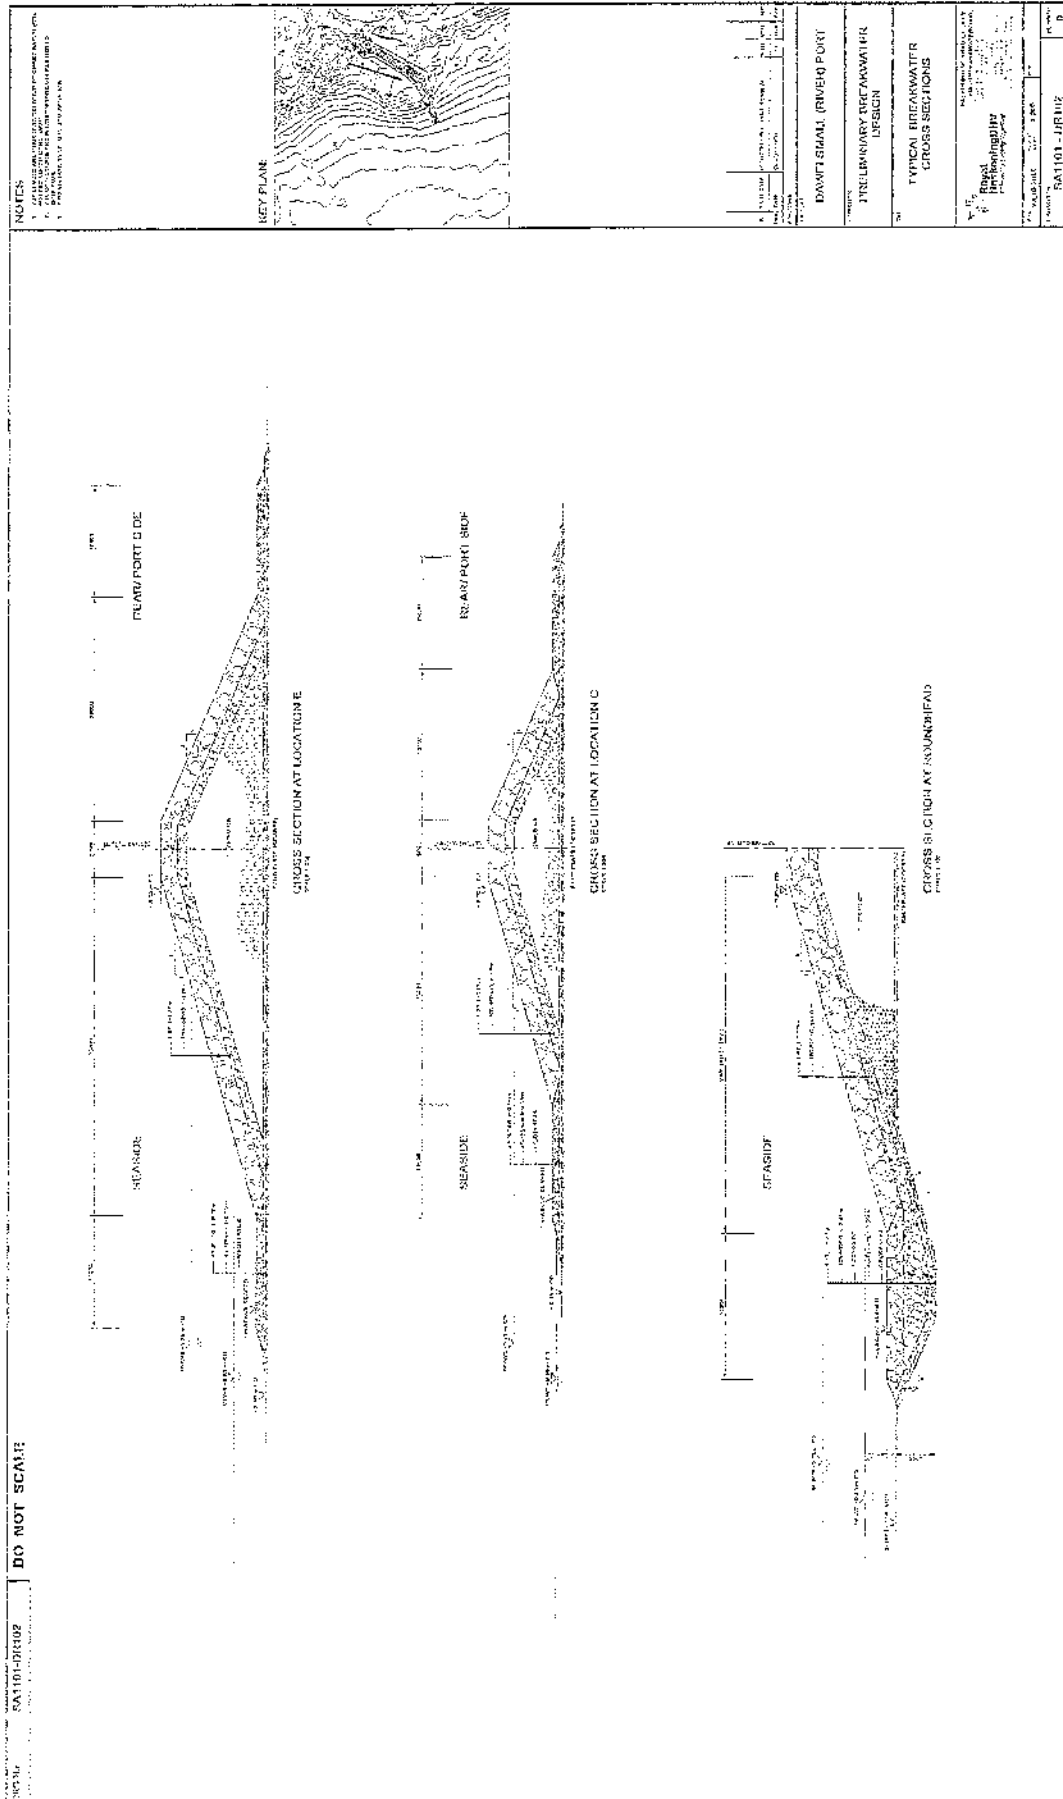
TYPICAL SECTION OF BREAKWATER
